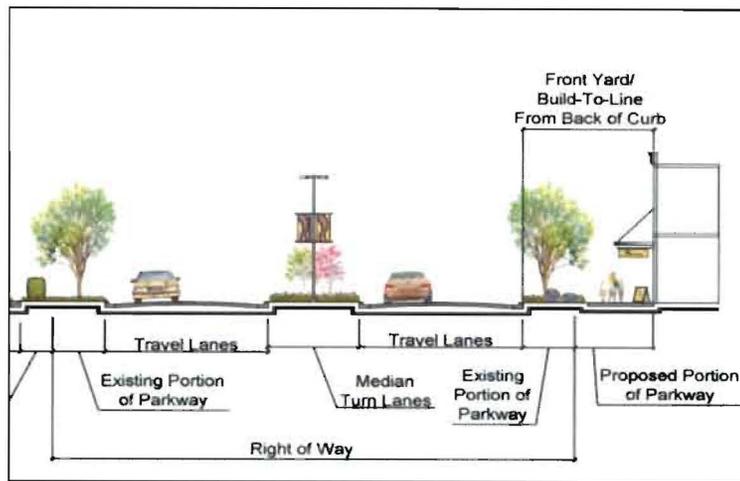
B-1, Example of Build-to-Line without Browser Lane
